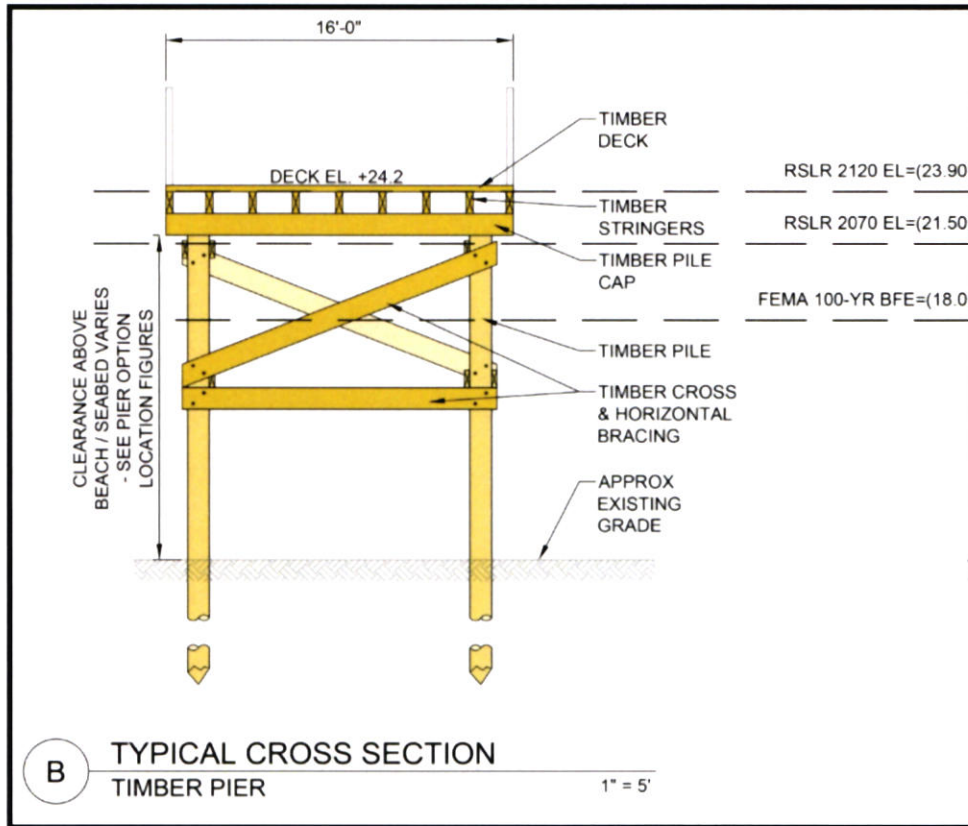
Proposed Timber Pier Conceptual Cross Section
